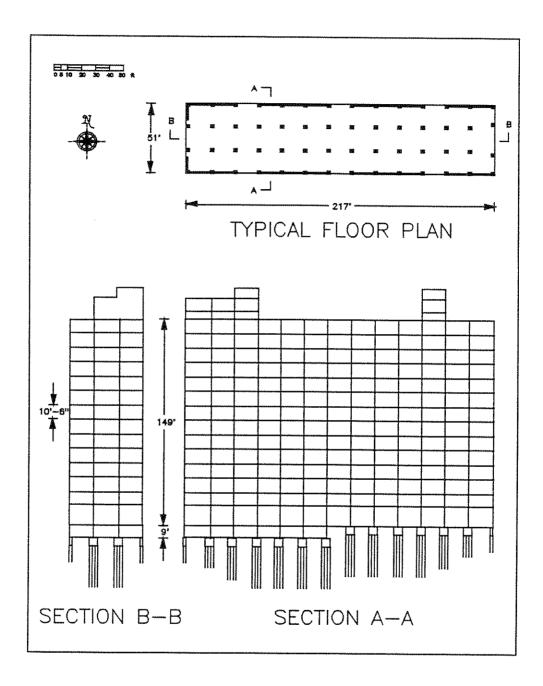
Sketch of the Hollywood Storage Building with its main features and dimensions.
